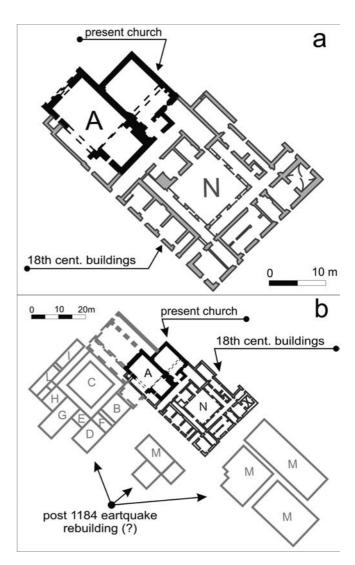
a, plan of the present church with the 18<sup>th</sup> century cloister. b, probable plan of the ancient Abbey, reconstructed on the basis of Martelli's (1957) and Zinzi's (1999) works, the 1409 drawing, and a typical Cistercian-abbey's plan.
